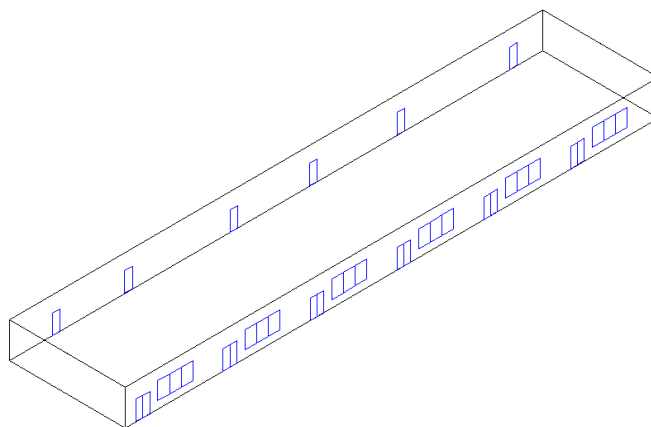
Model Building for One Story Low-Rise Masonry Strip Mall Building with Roof Height = 12'.
